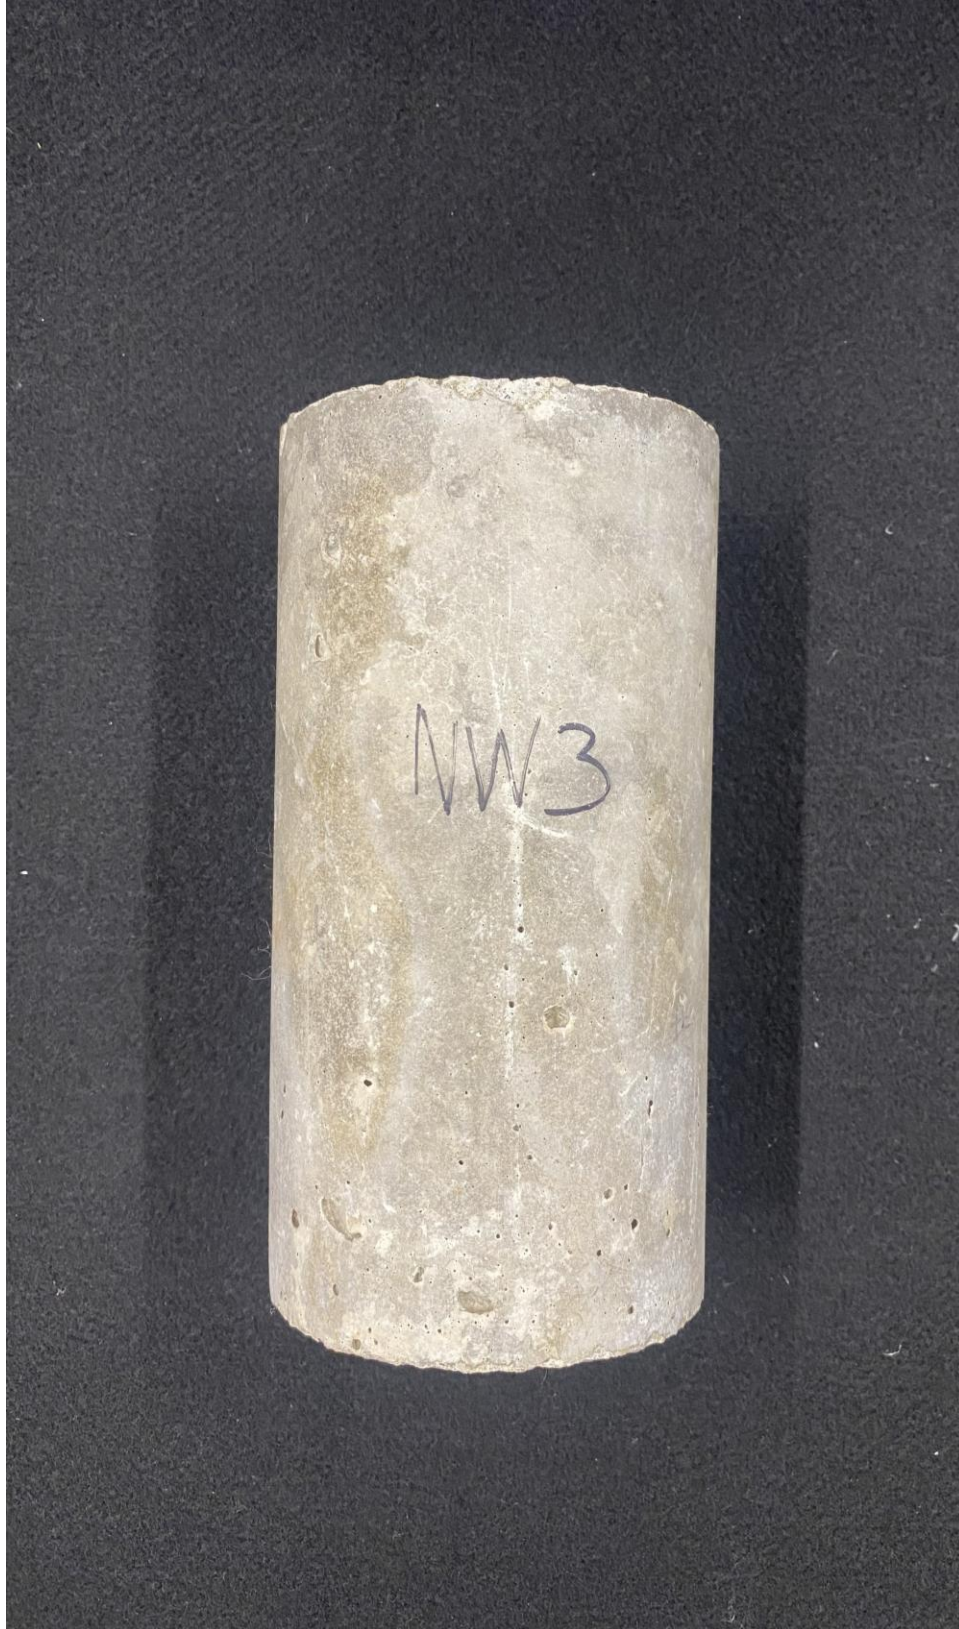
Cylinder 3 of normal-weight concrete deck at bridge F-818 (after testing).
